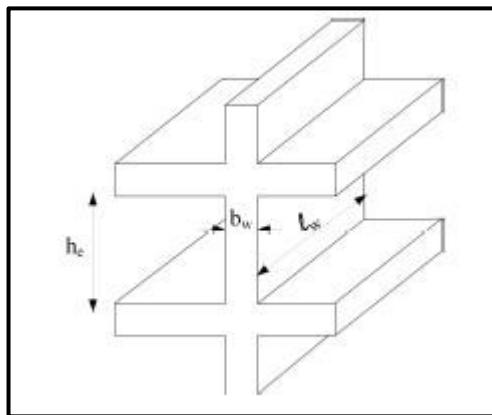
Elevation sail cut (DTR BC 2-48)
